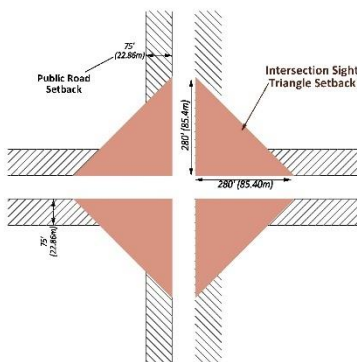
Public Road and Intersection Sight Triangle Setbacks Rural Roads
